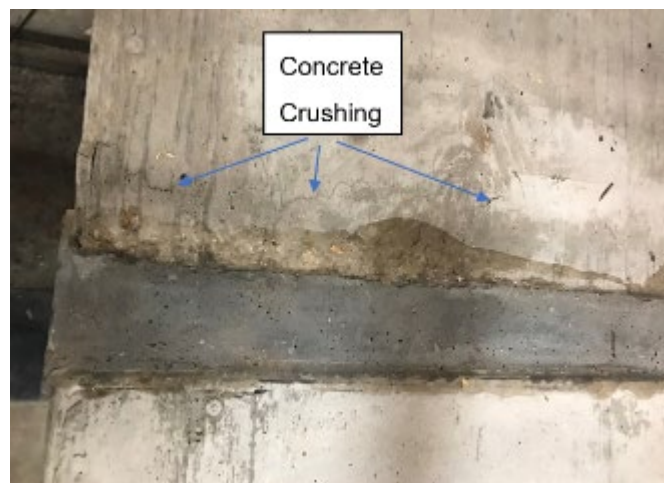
Concrete crushing at the top surface of J3 slab joint 1 indicating failure
